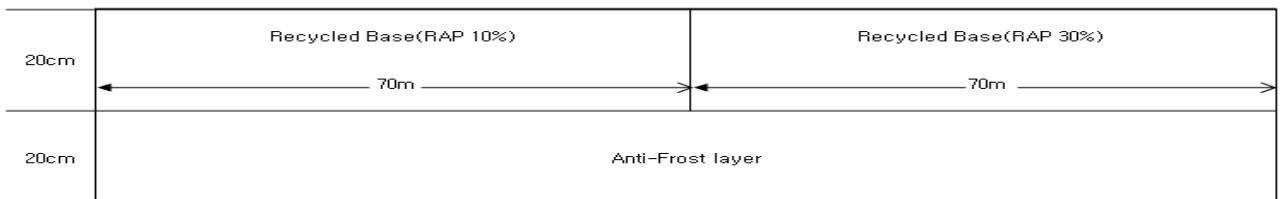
The cross-sectional diagram of 2nd RAP trial construction
